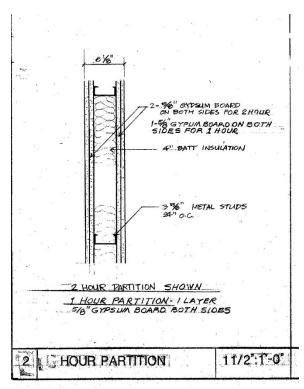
Detail showing new fire-rated gypsum board partition at bridge interior. Drawing A-7, Detail 2 from "Talcott Plaza" architectural drawings prepared by Thomas Munroe Nichols & Associates (1986). Accessed via Hartford GIS Scanned Document Viewer.
